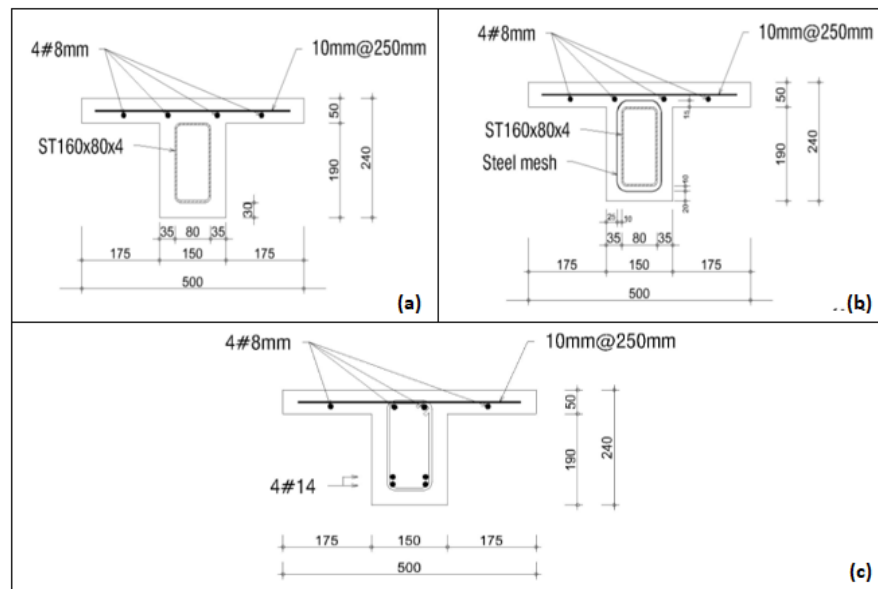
Cross sections of composite beams and control RC beam (dimensions in mm).
